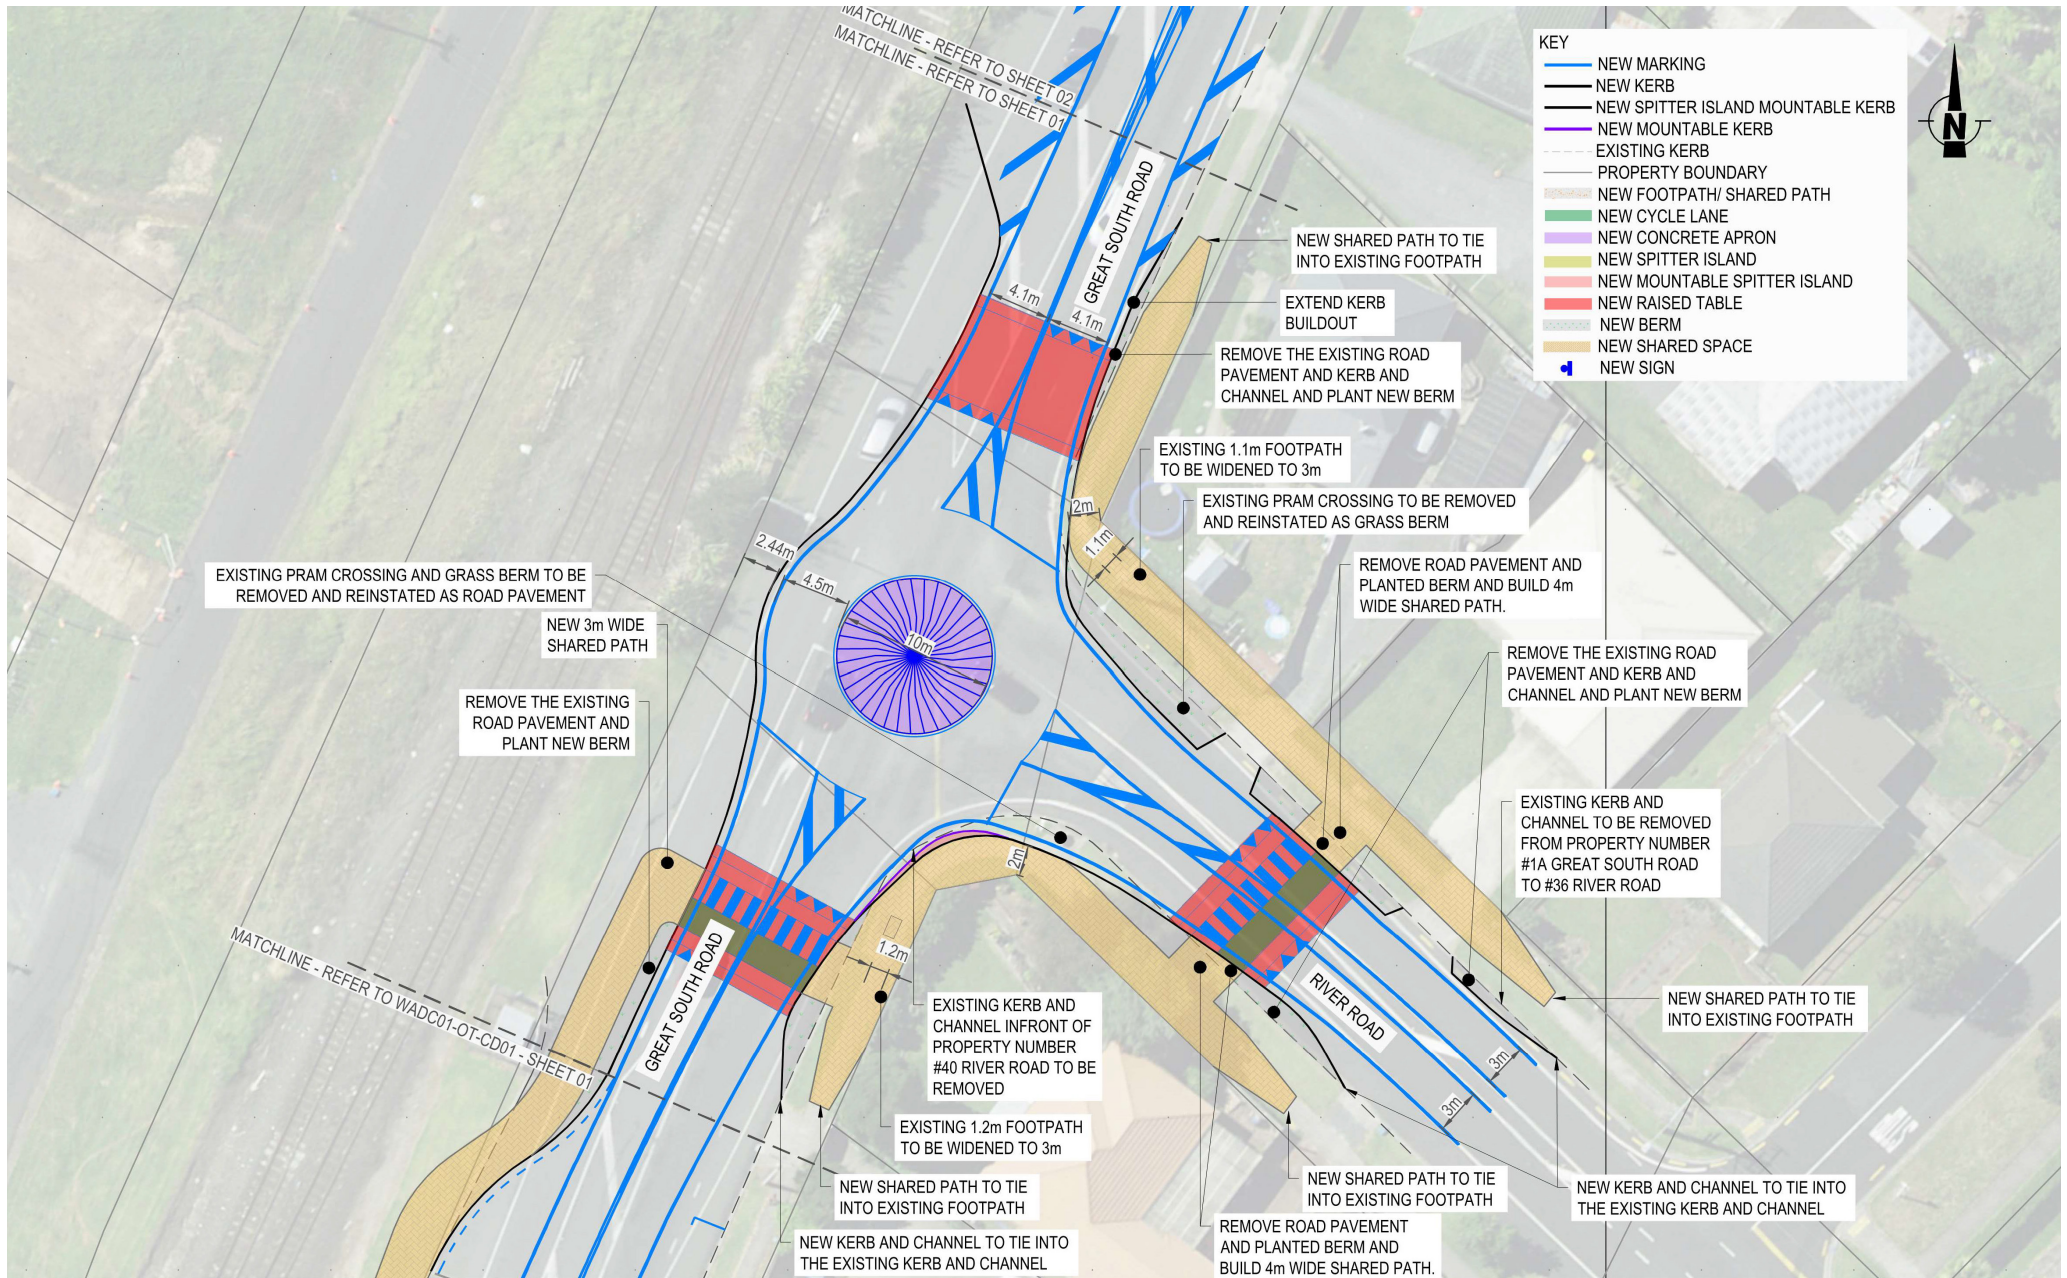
Great South Road / River Road Proposed Intersection Upgrade¹⁷
